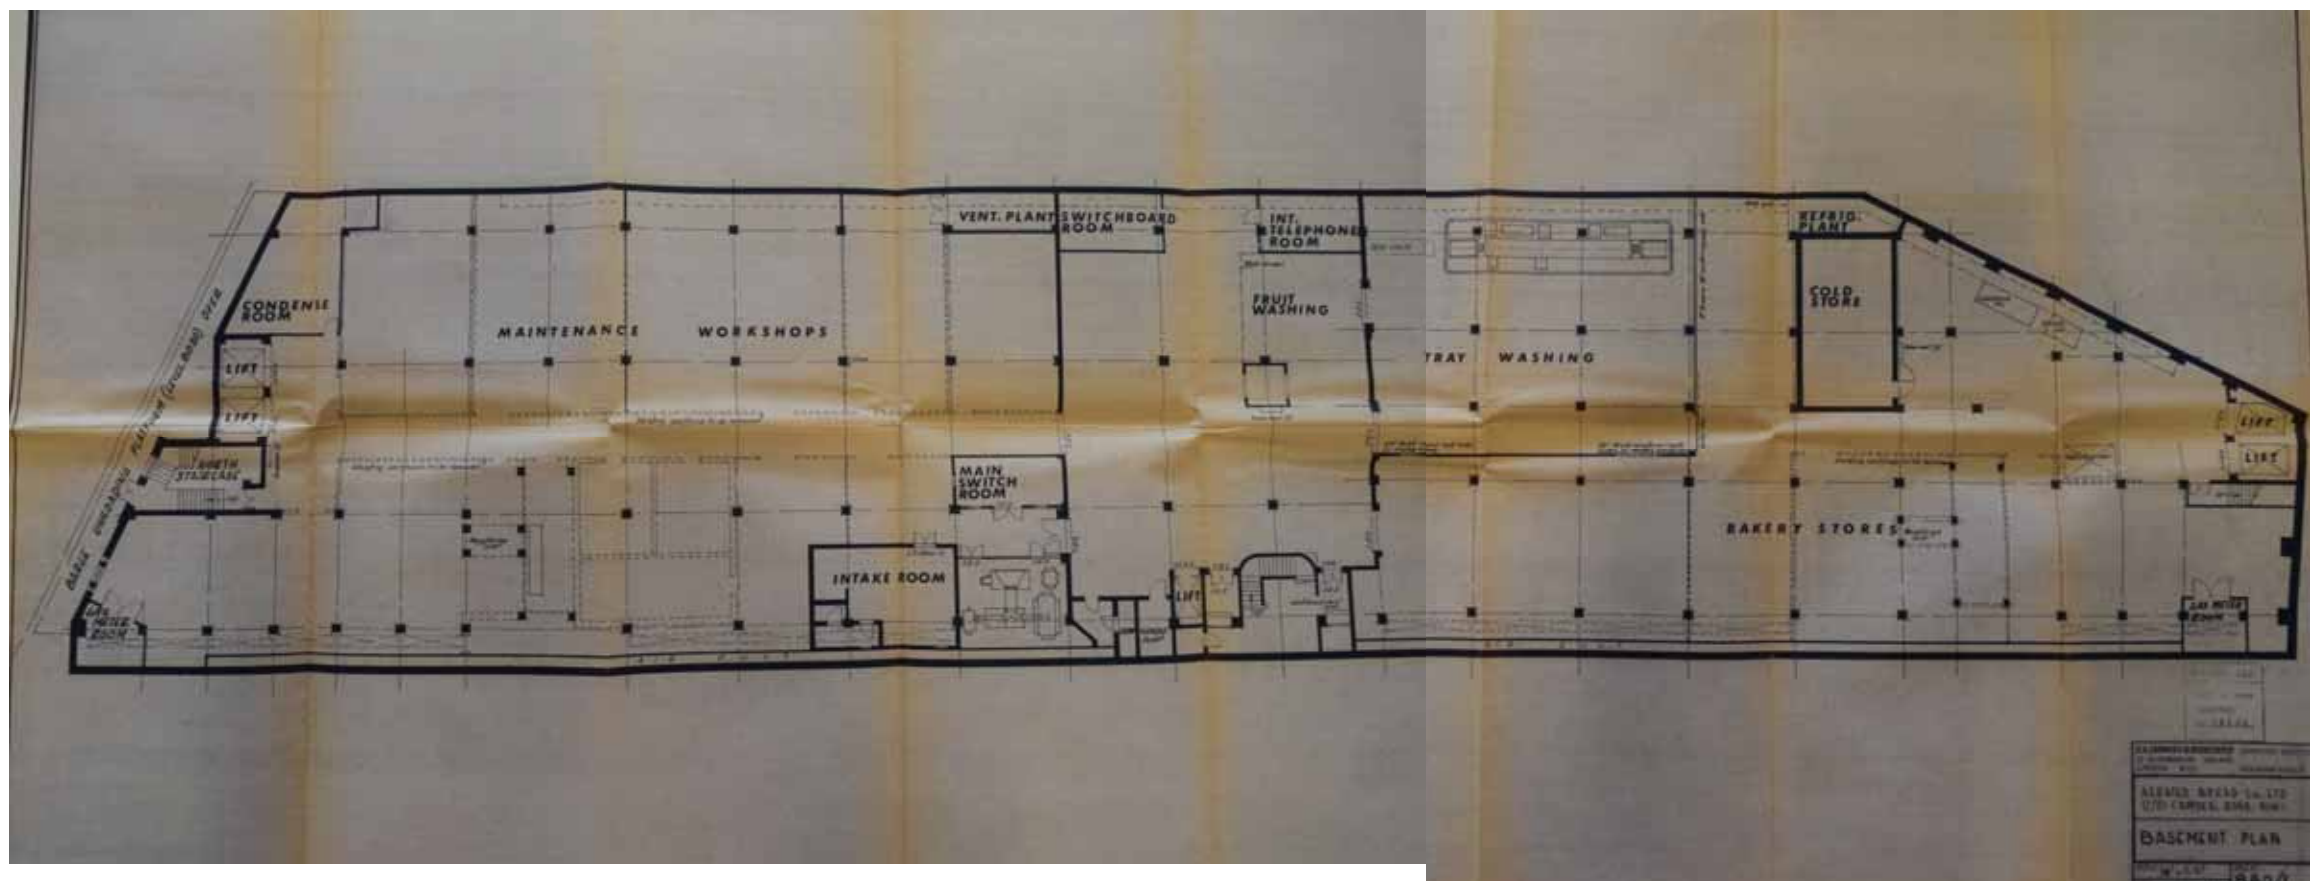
1969: ABC basement plan (Kentish Town Road side)
